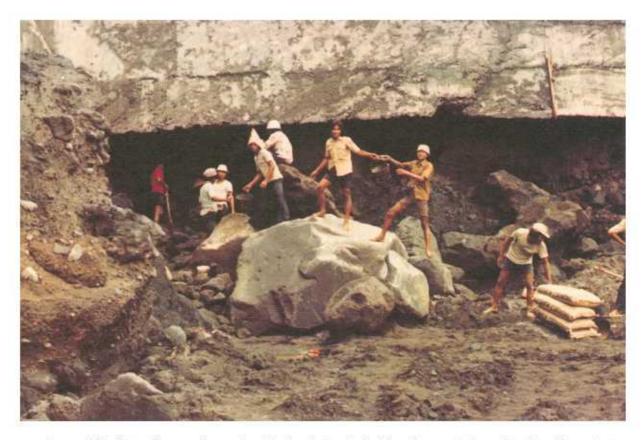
Destruction caused by scouring of the foundation of a check dam. Scour protection can be achieved by constructing a ground sill immediately downstream of the dam. Location: Yogyakarta Java. Indonesia. *Photo: M. Watanabe*.
